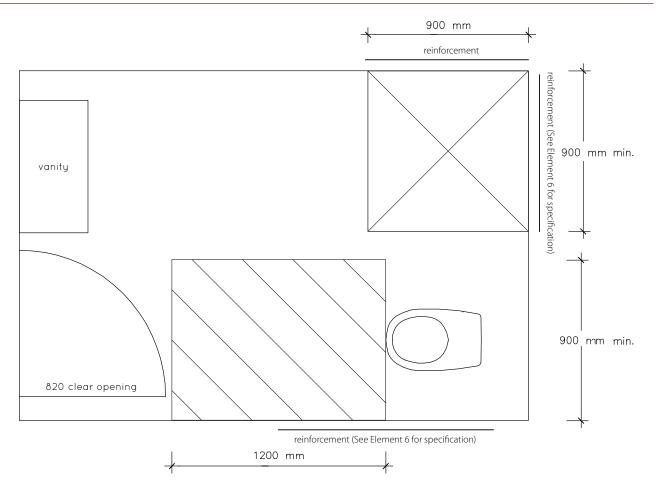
(b) Silver level ground (or entry) level toilet layout and space requirements in a combined bathroom.
